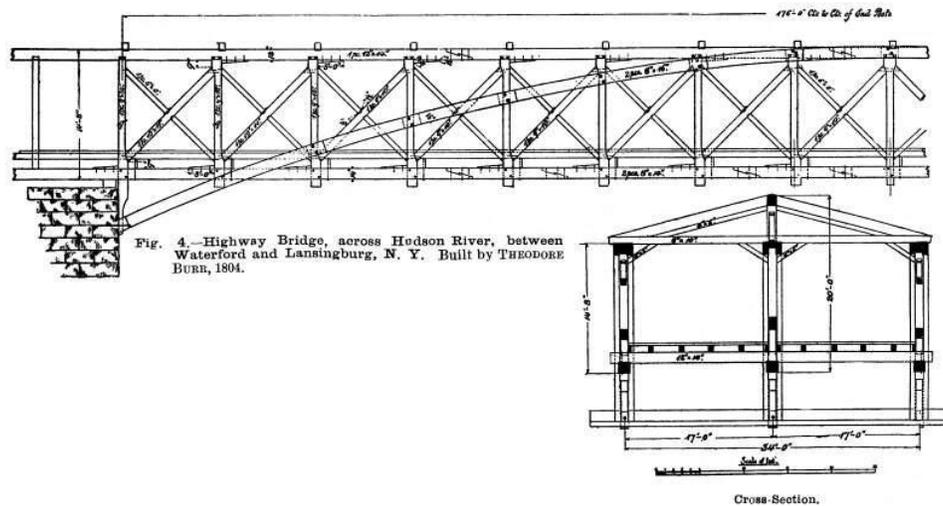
Burr's Union Bridge across the Hudson River between Waterford and Lansingburgh, New York (1804). From Theodore Cooper, "American Railroad Bridges," *Transactions of the American Society of Civil Engineers* 21 (July 1889): Plate VI.
